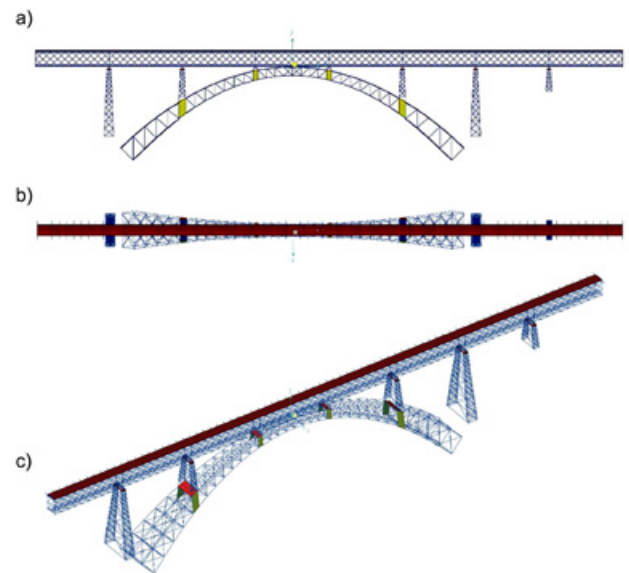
Finite element model of the bridge: (a) front view (b) plan (c) and 3D view (© Saisi and Gentile)
